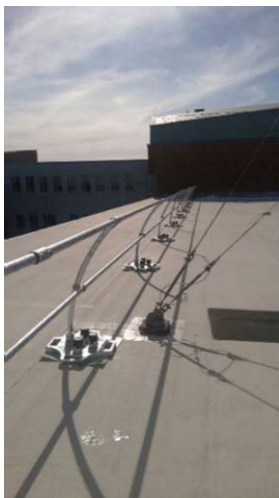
Guardrails installed on the roof of Kingsbury Hall
